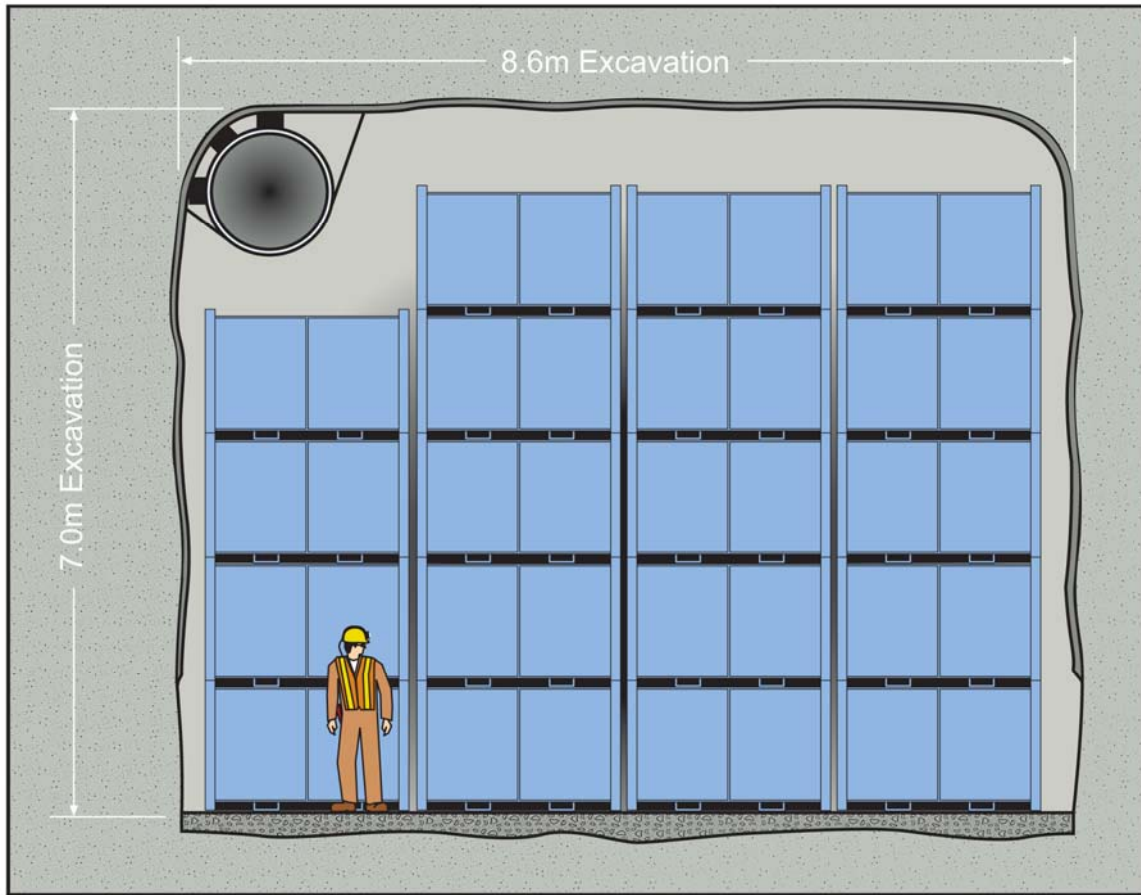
Emplacement Room Section View – P1 Profile for Bin Type Waste Packages
